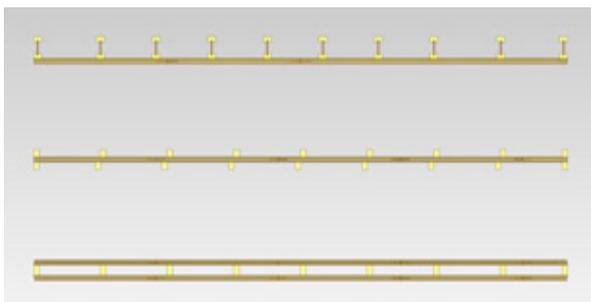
Examples of structural wall and floor carcasses used in the XL system; Top: Ribbed plyboard panel with I-studs/I-beams used in external walls and floor; Middle: Double ribbed plyboard panel for internal walls; Bottom: Boxed plyboard panel for internal walls.
